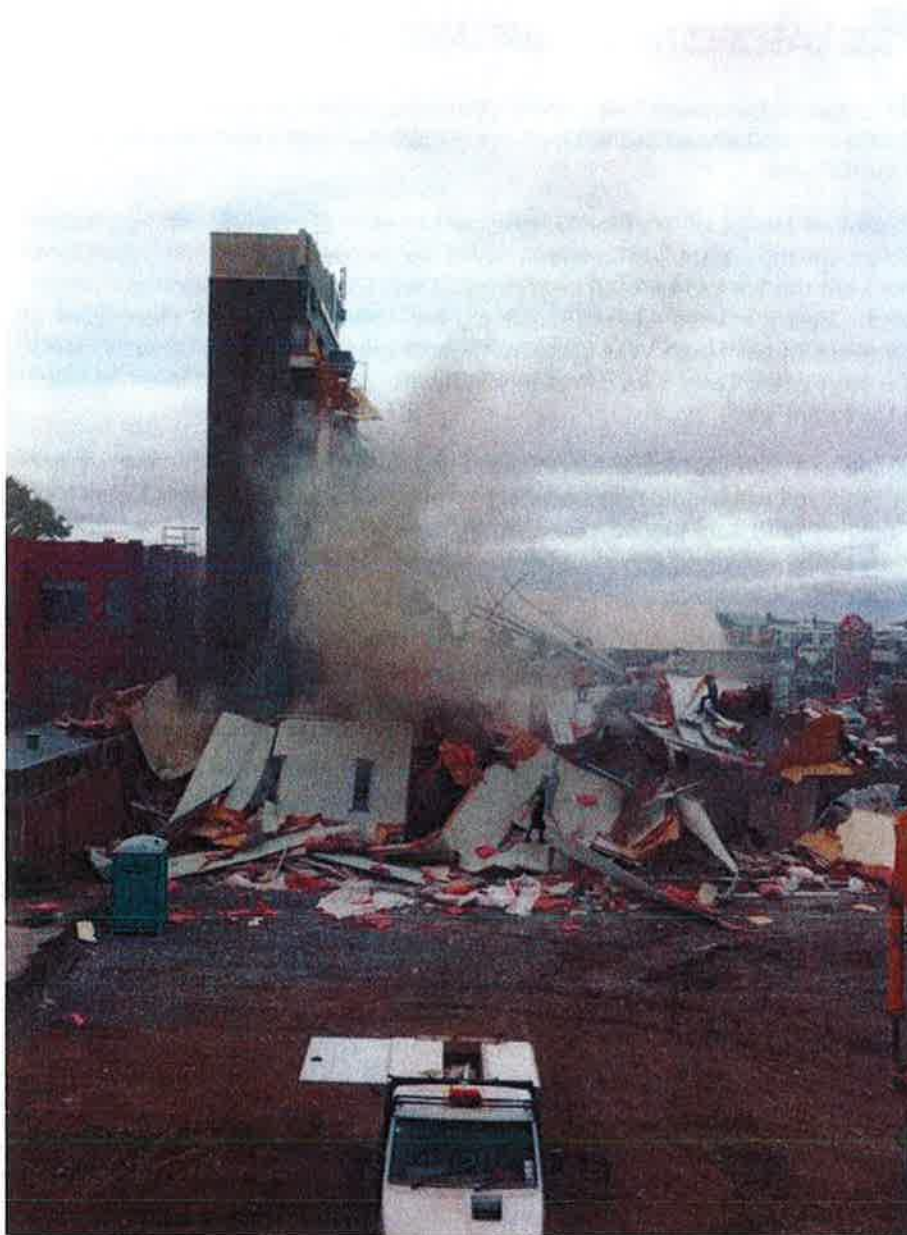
View of all of the west wall on Line A from Les Mills immediately after collapse before debris removal commenced. No signs of liquefaction can be seen on the vacant site. Smoke from the fire can be seen beginning to arise. Some of the upper light weight external panels between Levels 4 and 6 have fallen northwards, possibly as a consequence of the South Wall falling northwards onto them. Large diagonal cracks can be seen in the Level 2 to 3 masonry infill wall at the right hand end that has fallen onto the vacant site. Roof steelwork can be seen in mid-picture.
